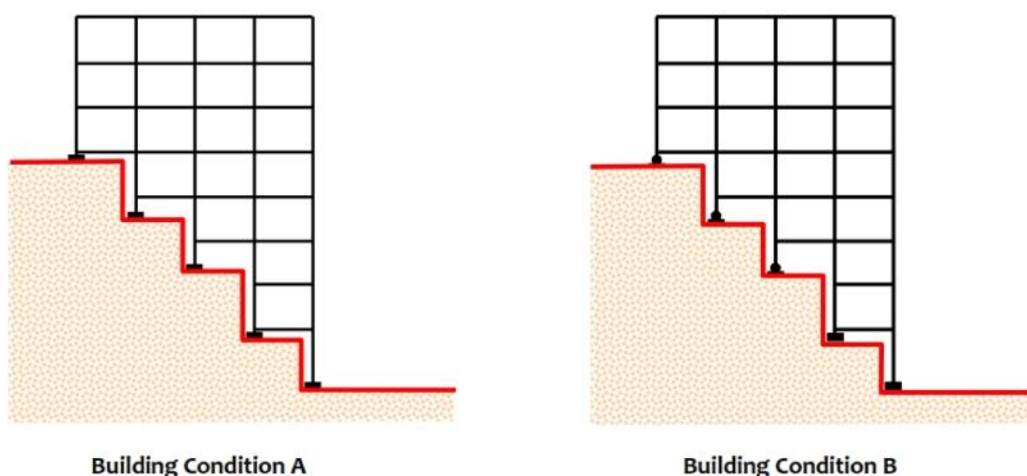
Buildings on slope: Stiffness irregularity in elevation due to unequal length of columns and degree of fixity at column base
